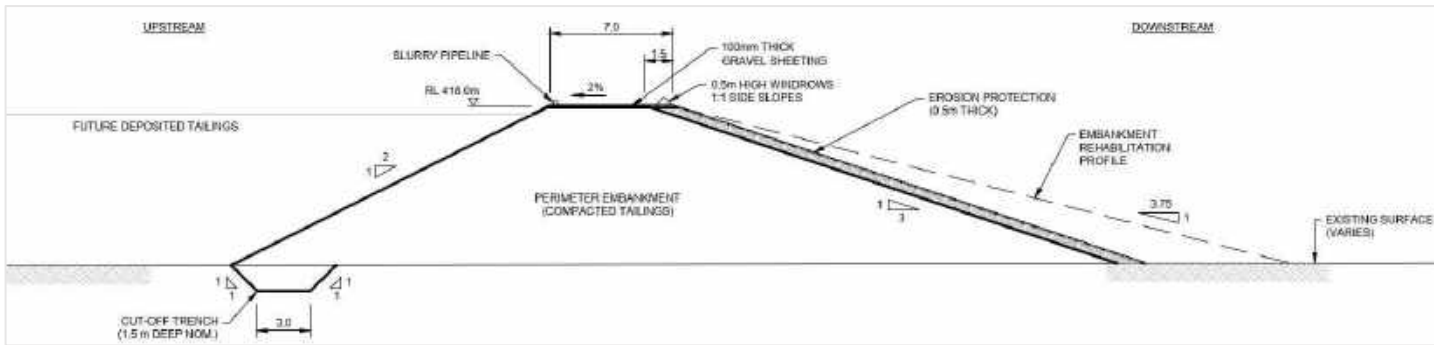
Typical cross-section of TSF Cell 3 perimeter embankment
